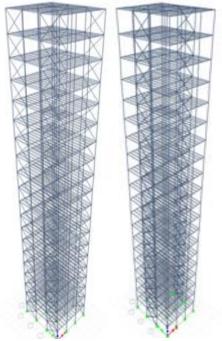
3D elevation view of X-bracings at outer and outer bays
